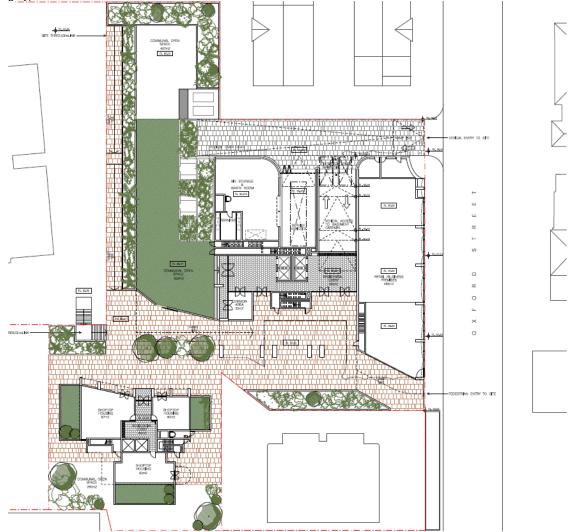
Originally proposed ground floor plan for '2-tower' design (Tower B on the left and Tower A on the right).
